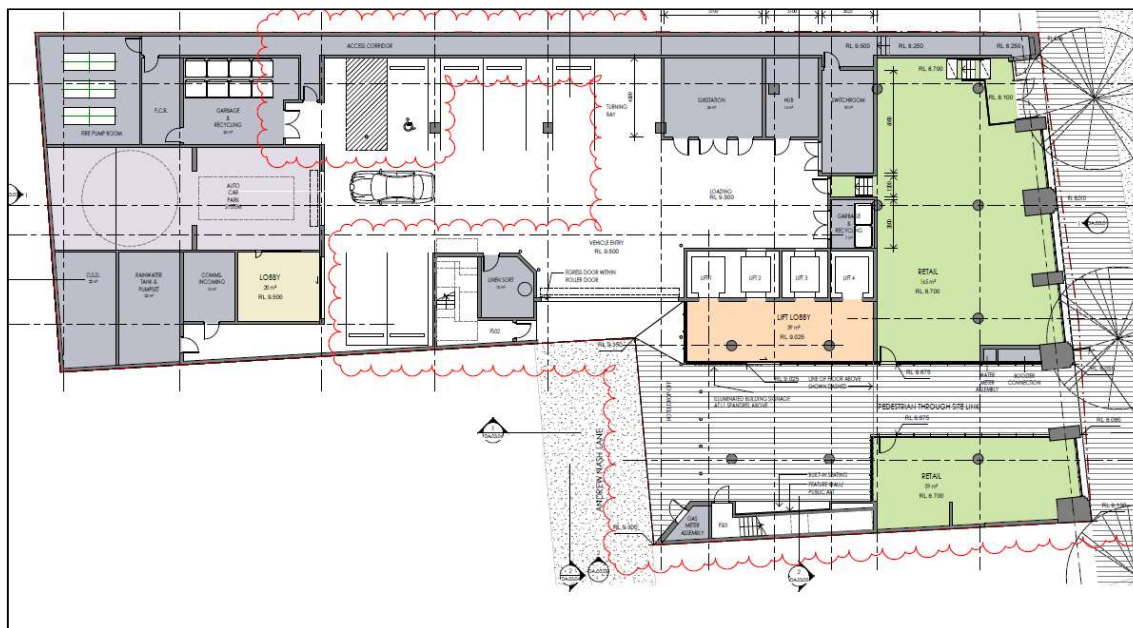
Ground plane arrangement as lodged showing porte cochere
